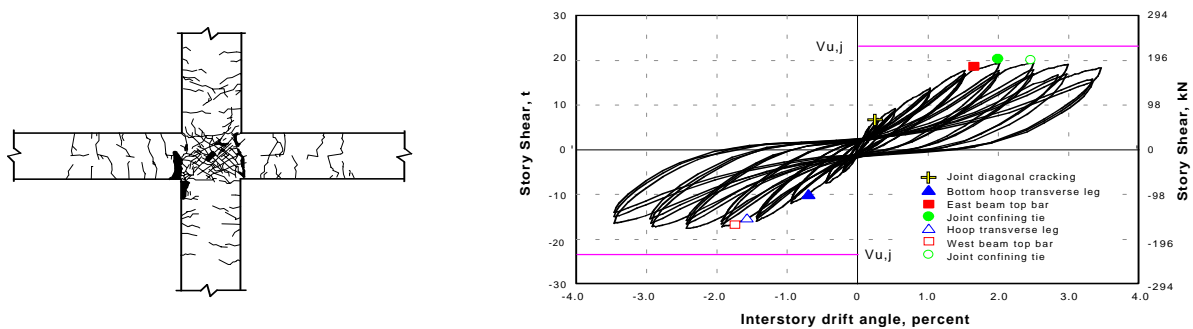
Final Cracking Pattern and Hysteresis Loops for Specimen J1
